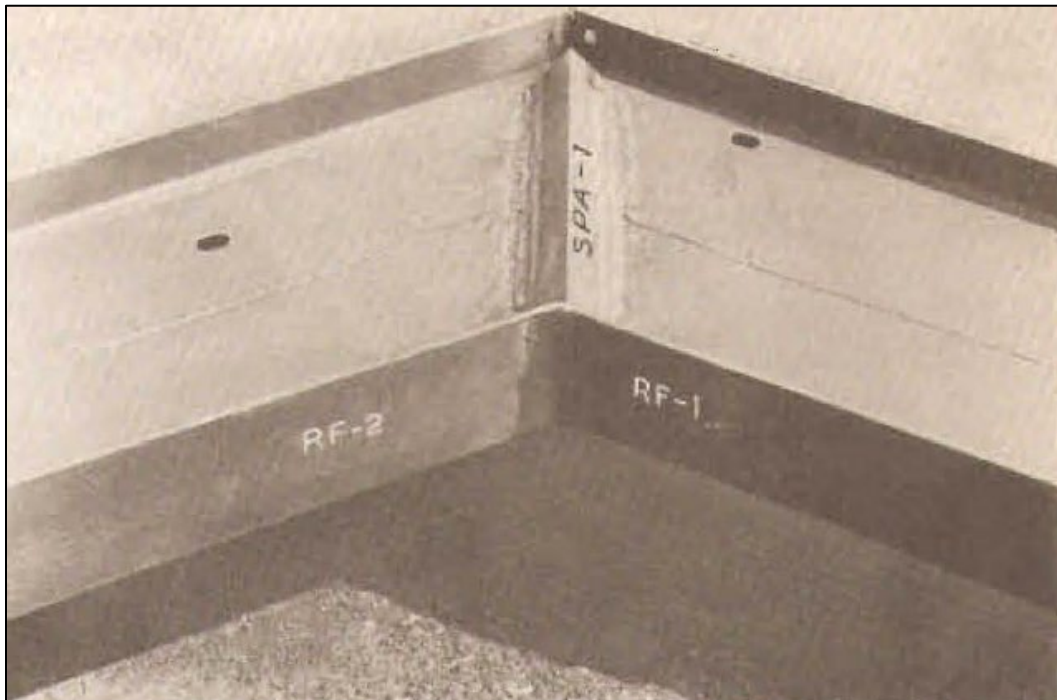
The frame of a 40 ft by 100 ft Butler Warehouse with important frame members identified, 1945 (Butler Manufacturing Company, "U.S. Navy rigid frame utility warehouse building erection instructions for the 40'-0" x 100'-0" building," Kansas City, MO: Butler Manufacturing Company, 1945).
